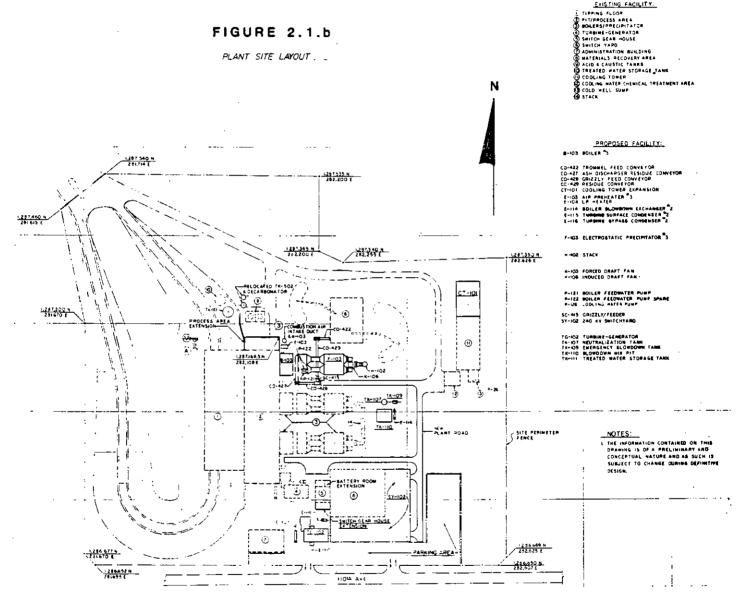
a shows the existing land use in the vicinity of the Resource Recovery site. The layout of the proposed plant expansion is shown in Figure 2-1.b. As shown, the battery limits of the plant will not be enlarged. The electrical generation capacity will be increased by 29 megawatts (MW). The third boiler is to be situated north of the existing units and adjacent to the materials recovery building. The project is designed so that the operation and layout of the materials recovery area is not affected by construction. The second turbine-generator will be constructed just south of the existing one. In addition to the construction of the two boiler plant and appurtenances, land use in the vicinity of the plant has undergone the following changes since the submittal of the original application (Figure 2-1.c):
